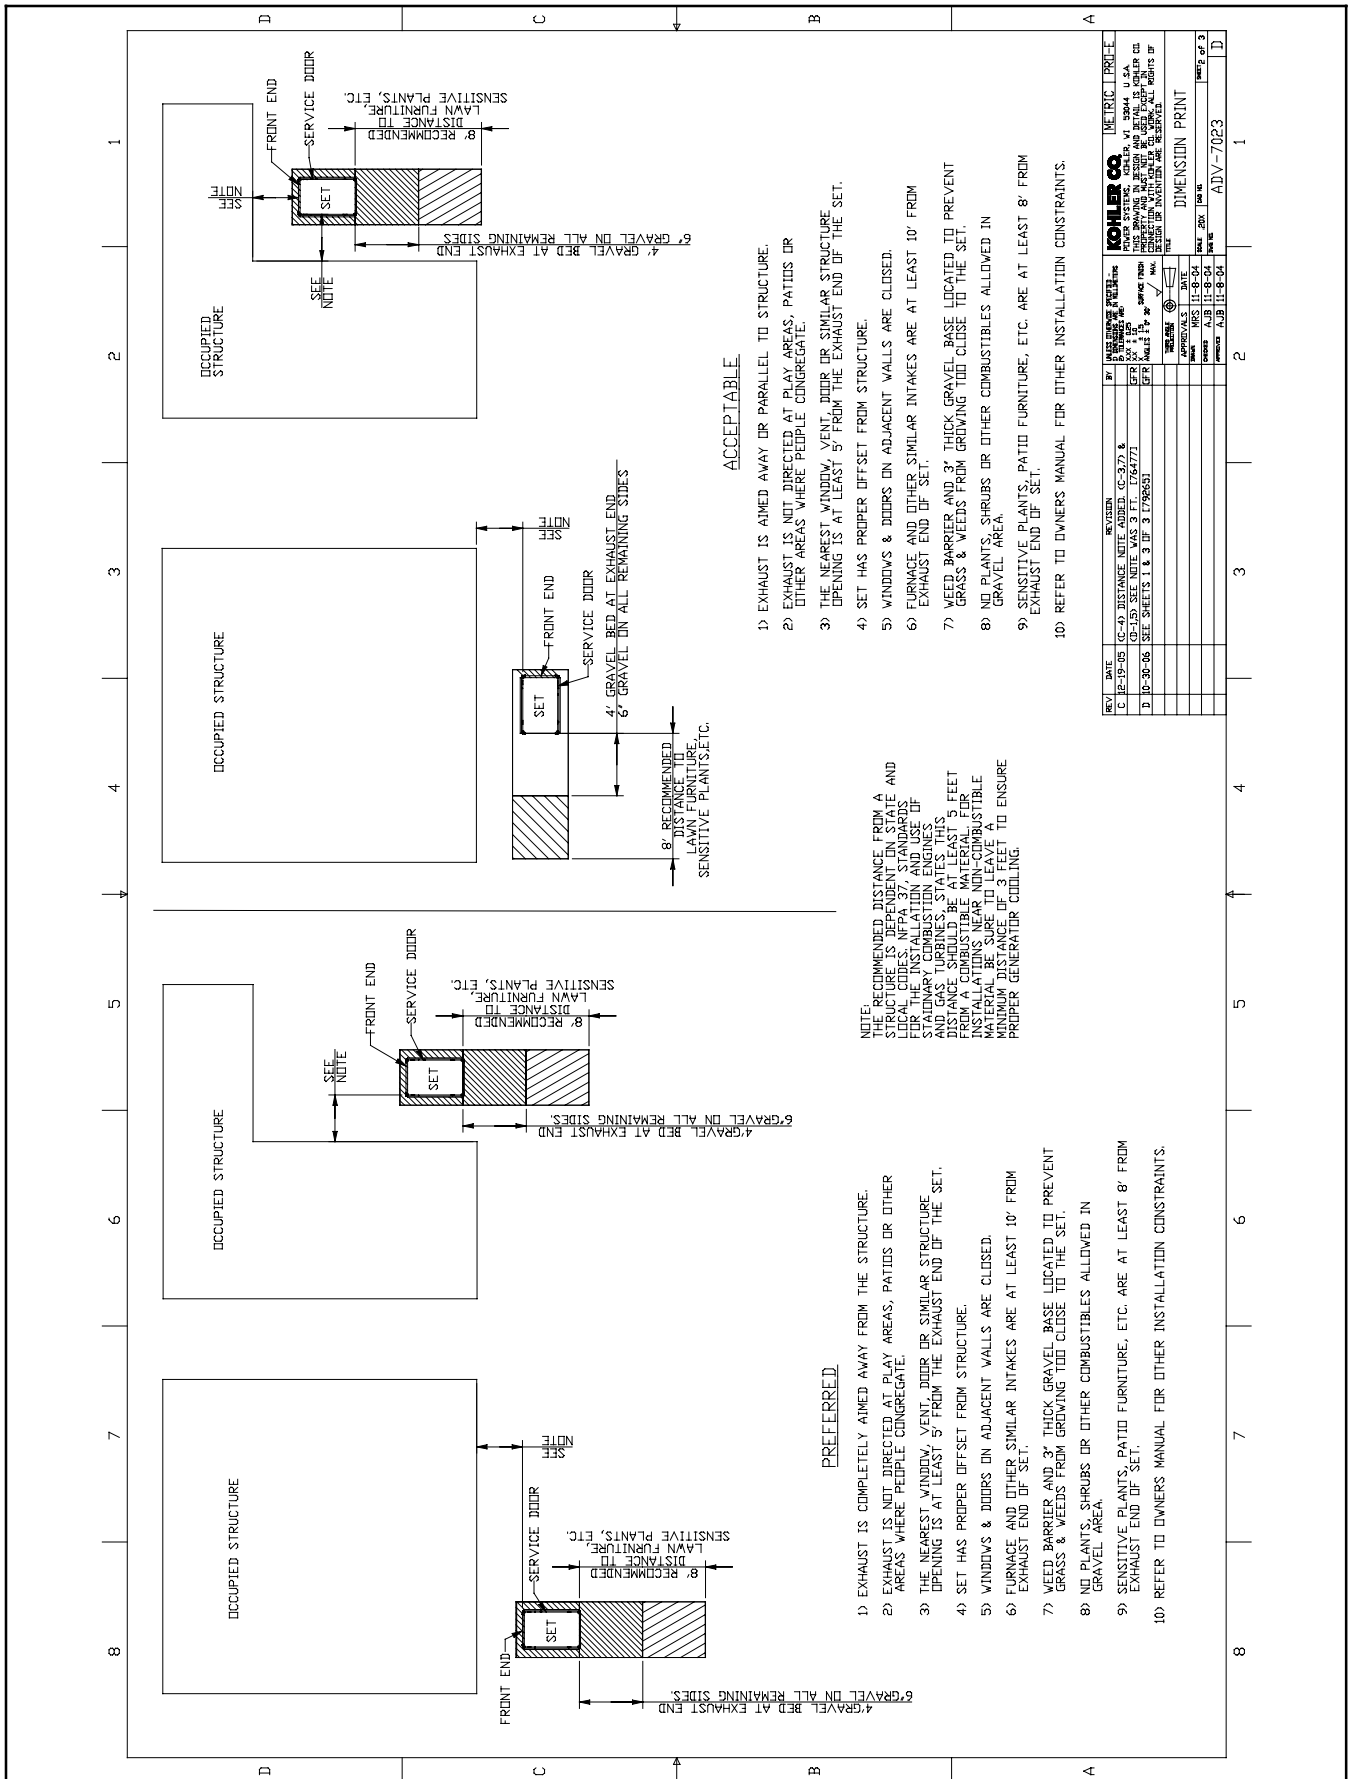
Generator Set Mounting Details and Dimensions, ADV-7023A-D
